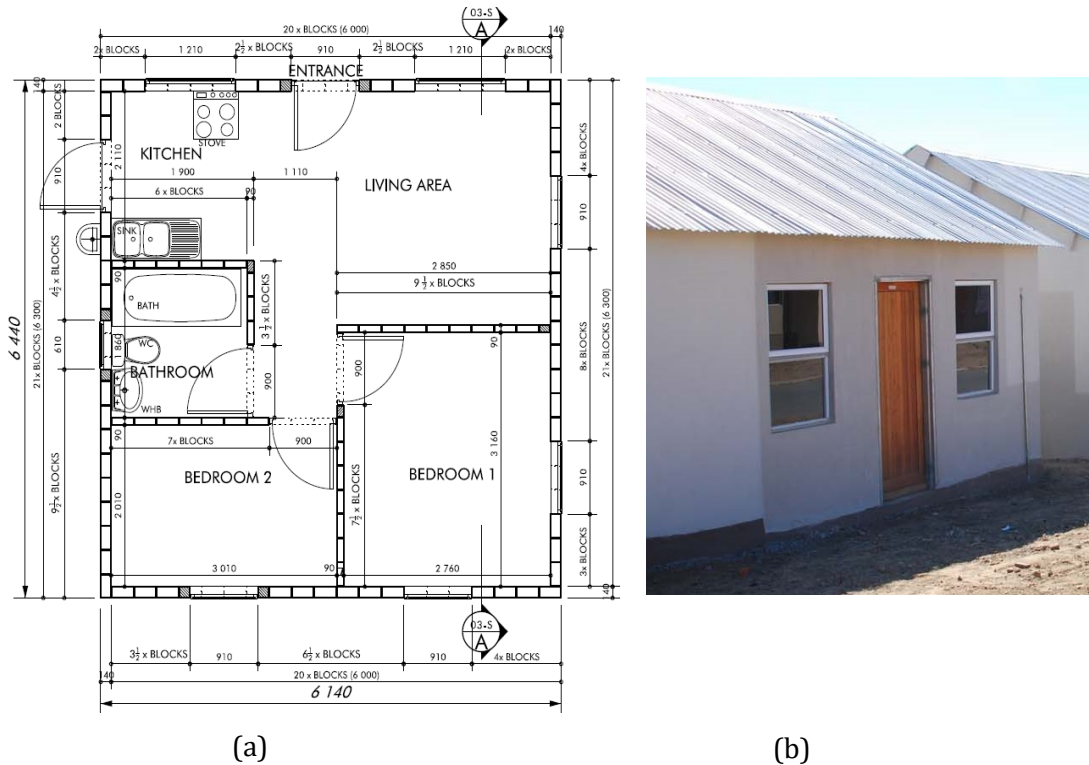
Typical 40m<sup>2</sup> government subsidised concrete masonry house (a) plan (CMA, 2011) and (b) under construction
